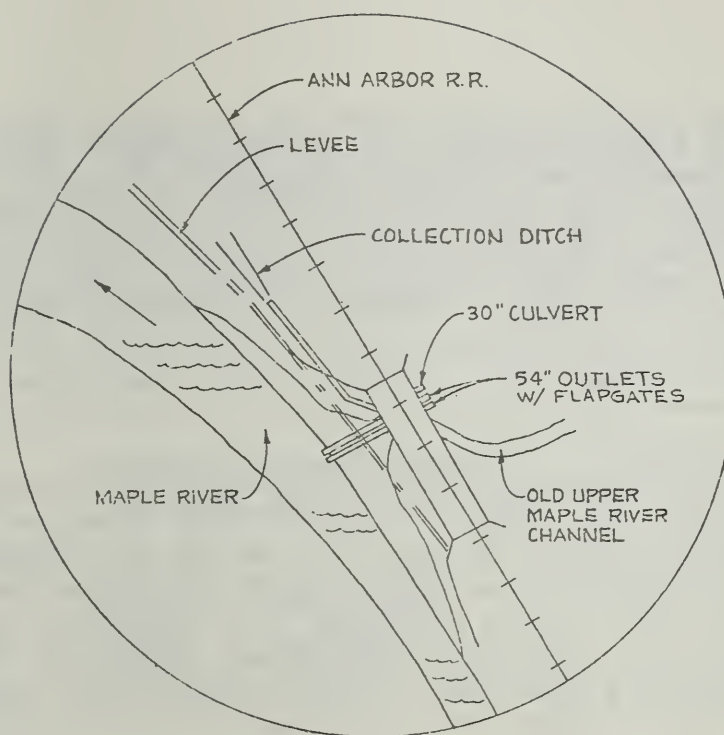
OUTLET SYSTEM AT RAILROAD AND FLOODWAY
